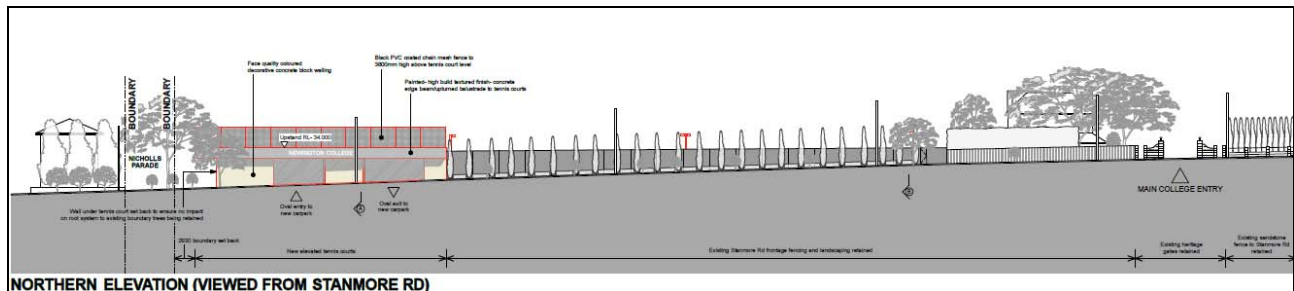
Northern elevation of proposed Old Boy's Sporting Complex
